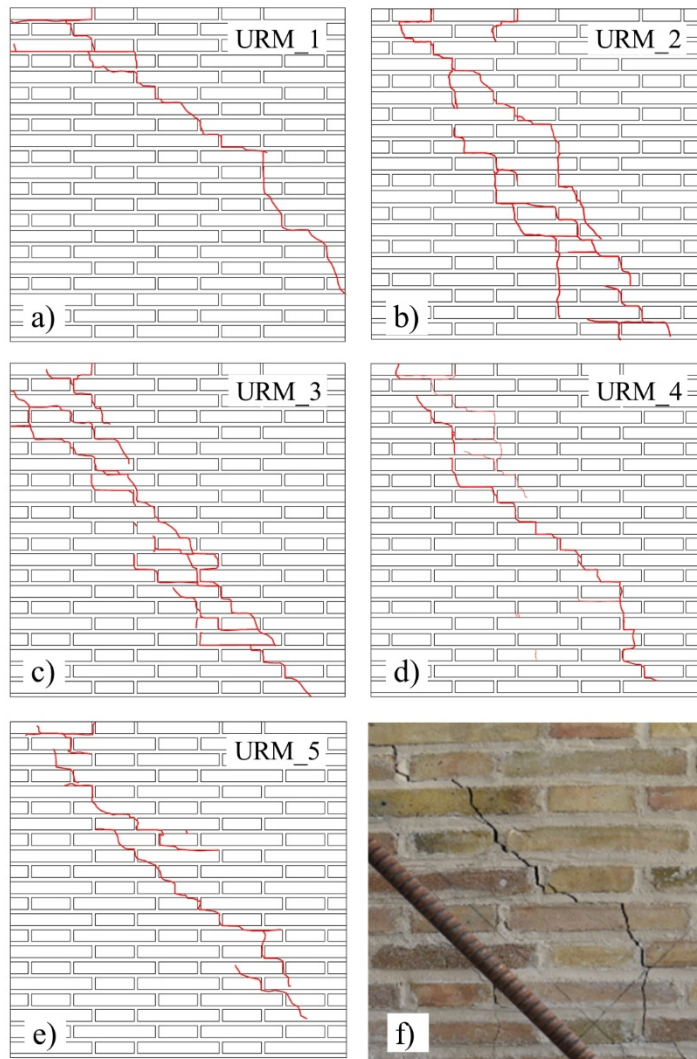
a) to e) Crack patterns at the end of the test for the five specimens. f) Pattern detail of wall URM_2 with cracks involving both bricks and mortar joints.
